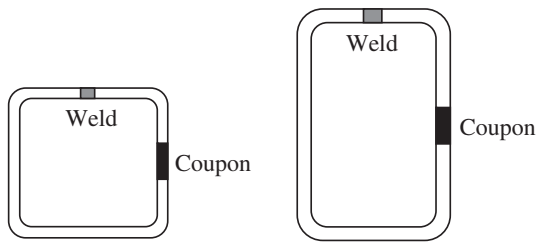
Location of coupon and weld in hollow sections.
